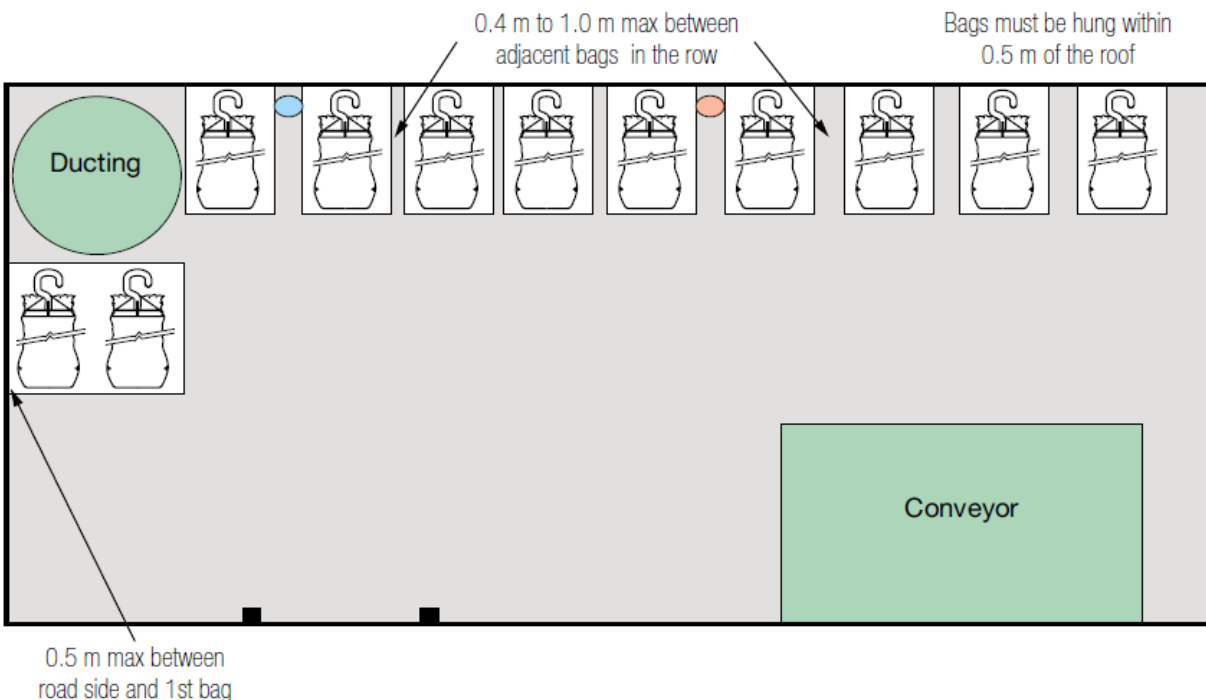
Typical Configuration of Bags Hung around a Suspended Obstacle [2]
